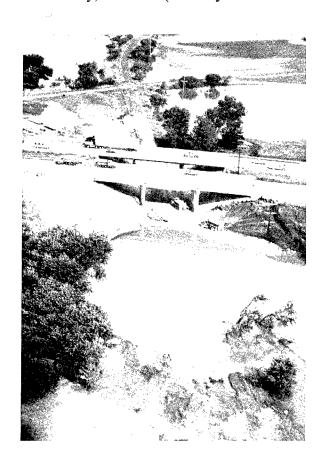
Aerial view, looking northwest, of scour hole and southwest embankment restoration at U.S. Highway 54 and KD Trail, at Jefferson City, Missouri (courtesy of Missouri Highway and Transportation Department).
